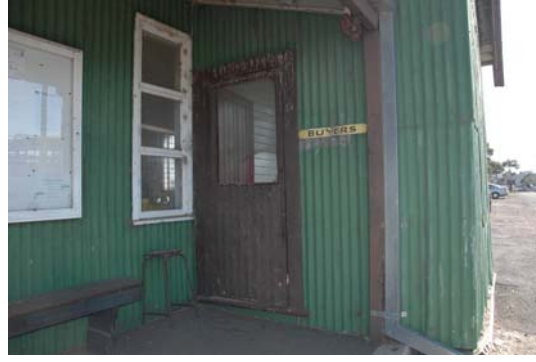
Market Offices building (east elevation. Detail of introduced three paned timber framed window of lunch room and early timber door to the office (south face).
